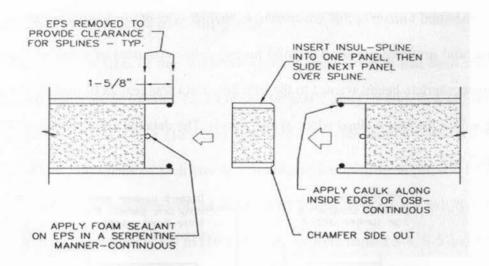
Typical cross section for SIP floor and roof foam-spline connection before
